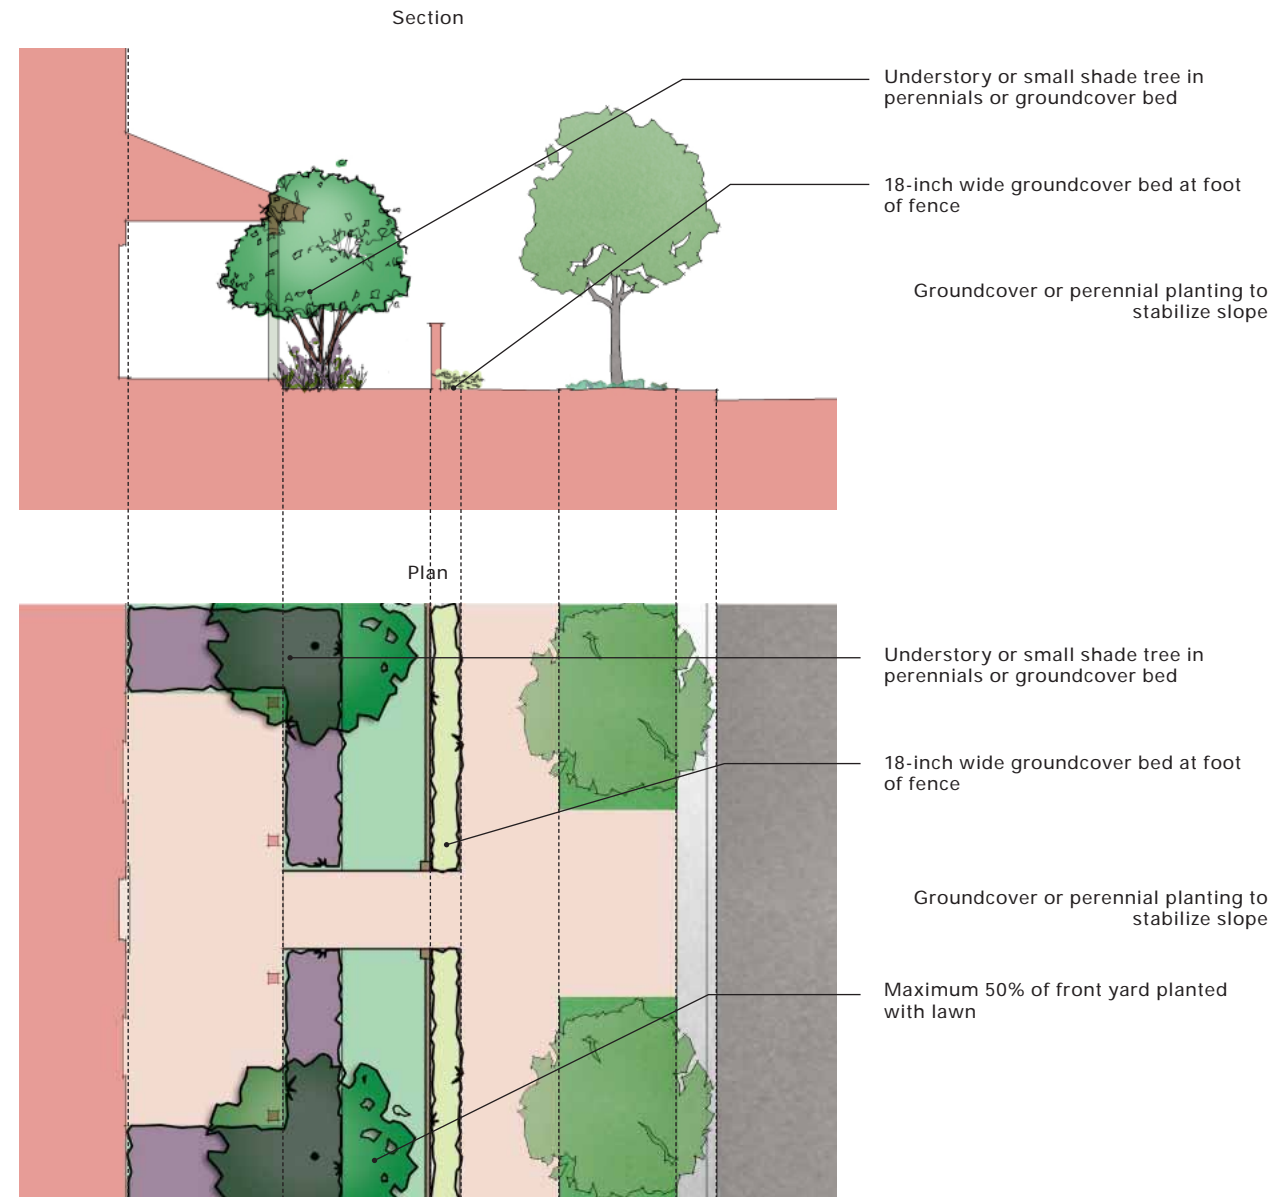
Typical residential frontage with fence showing proposed planting in plan and elevation
